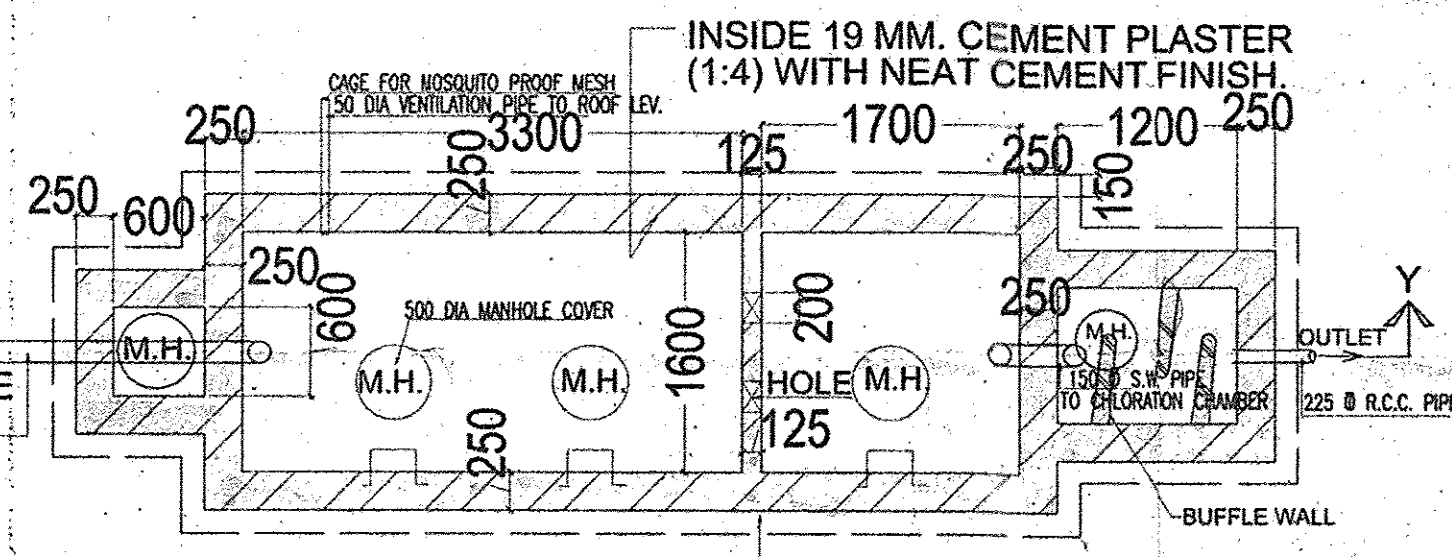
DETAILS OF SEMI-UNDERGROUND RESERVOIR
